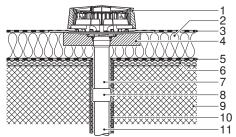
Installation in a solid roof insulated with bitumen roof foil
